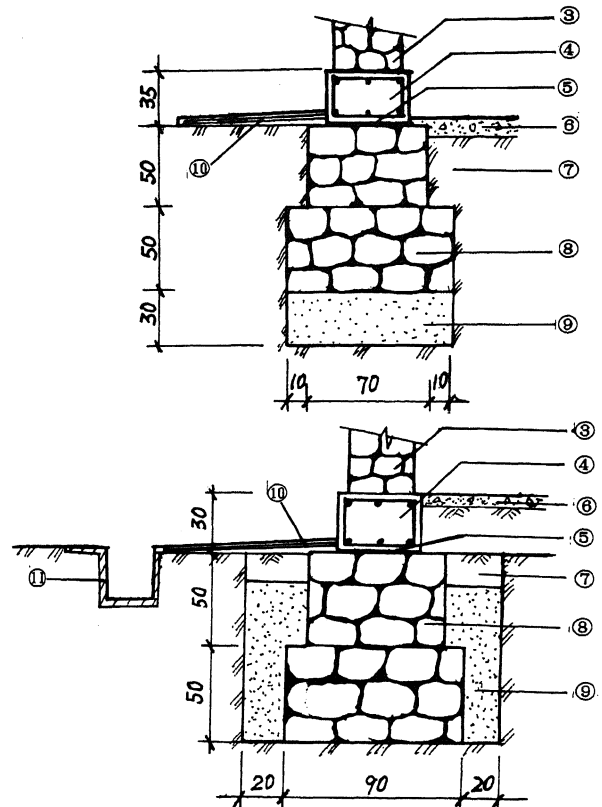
Sand Cushion and Sand Surrounding Foundation For Two-storey House
